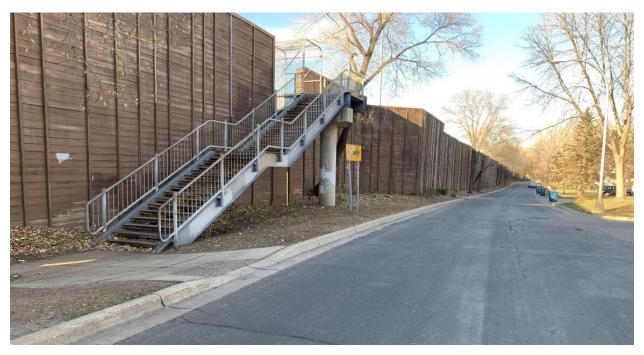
Stairs on the east side of existing Bridge #9888 over I-35W (Nov 2023). Photo Credit: City of Richfield
